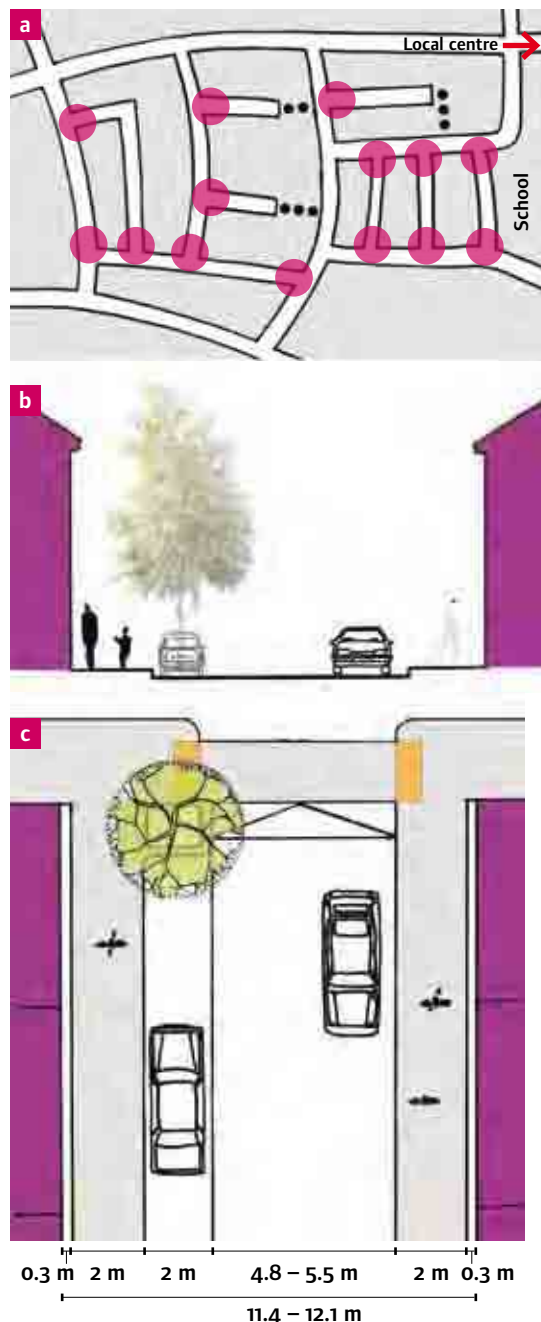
Typical representation of a street character type. This example shows the detail for minor side street junctions. Key plan (a) shows the locations, (b) is a cross-section and (c) the plan.
